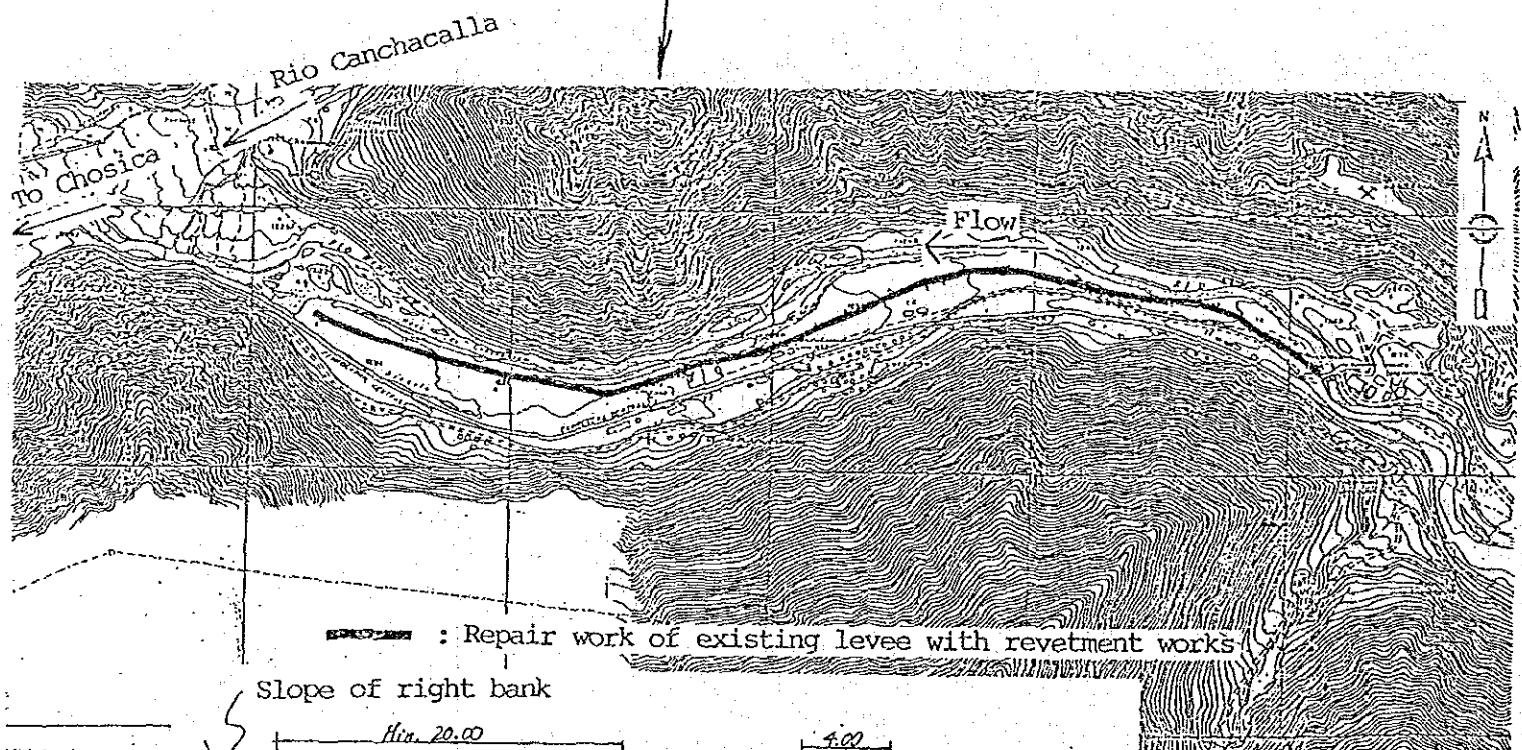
Proposed River Improvement Plan (8/8)
